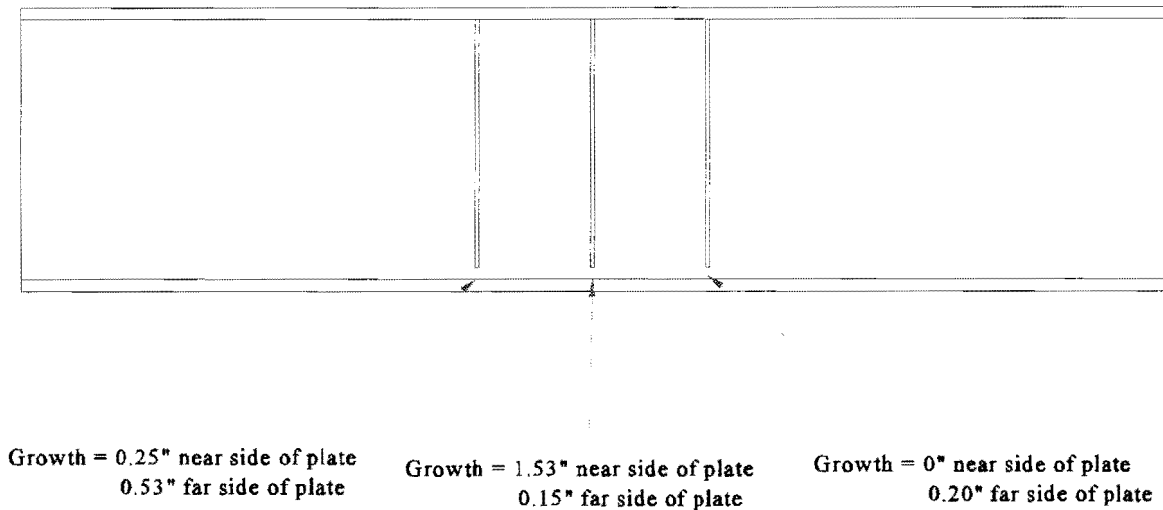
Growth of web-to-flange cracking Test Girder 2.
